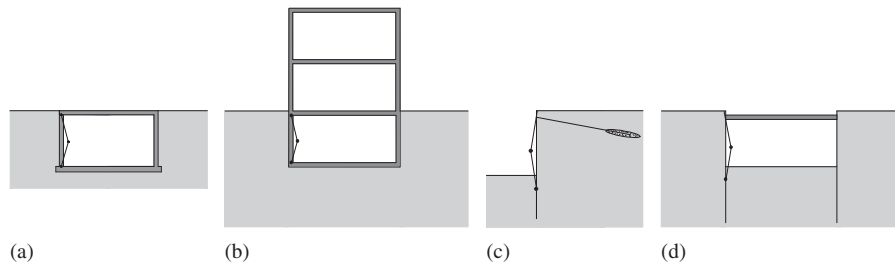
Situations where the studied failure mechanism may govern the behaviour: (a) frame-shaped cut-and-cover tunnel (construction stage); (b) building basement; (c) anchored wall; and (d) braced cut.
